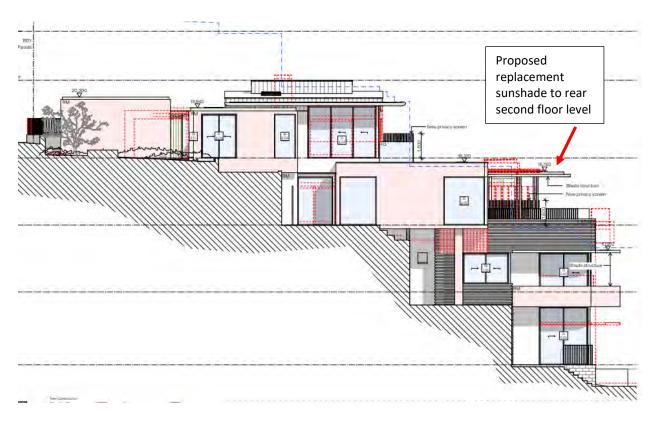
Excerpt from North Elevation (Architectural Drawing 200 – North Elevation)
